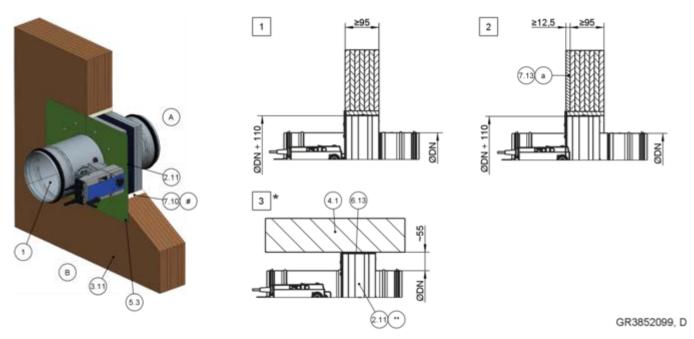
Dry mortarless installation into a solid wood wall or CLT wall, with installation kit TQ2
